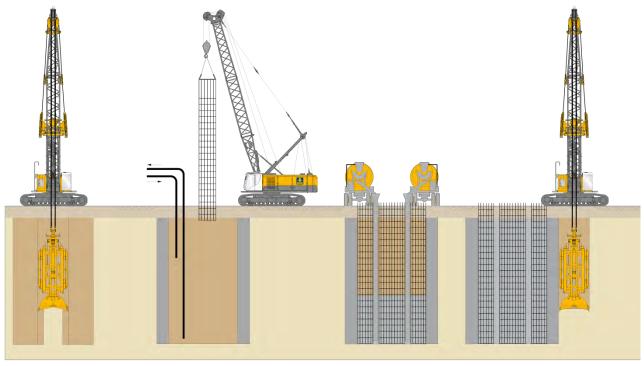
Construction sequence of diaphragm wall with cast in situ concrete and reinforcement
